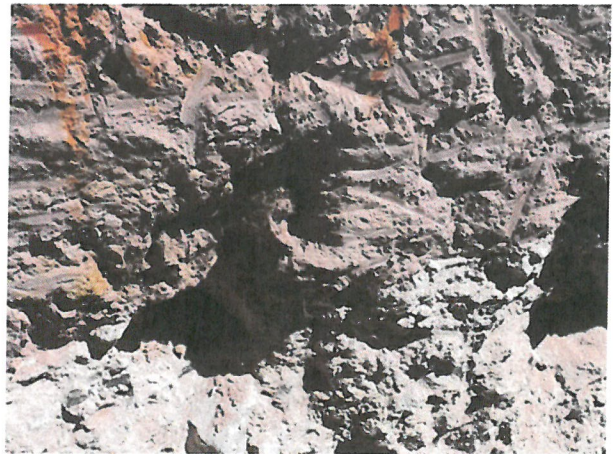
A5-6 – T-14 location: Looking southwest down into trench at the southwest wall. The chimney drain can be seen in the middle of the photo.
